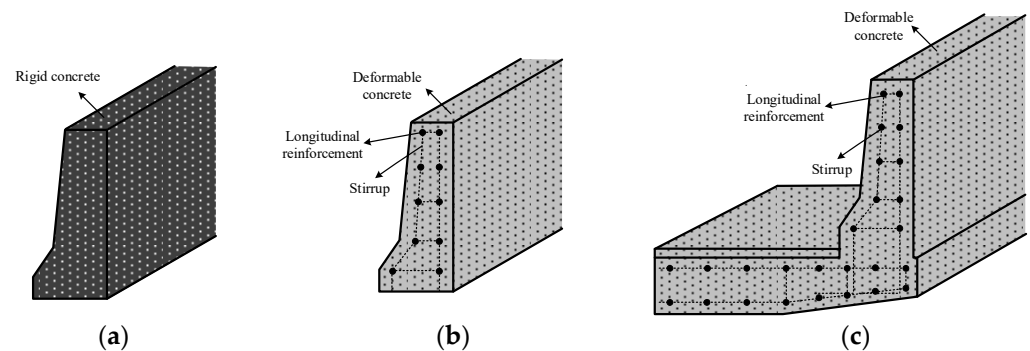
Three test models for the reinforced concrete barriers: (a) Case 1; (b) Case 2; (c) Case 3.
